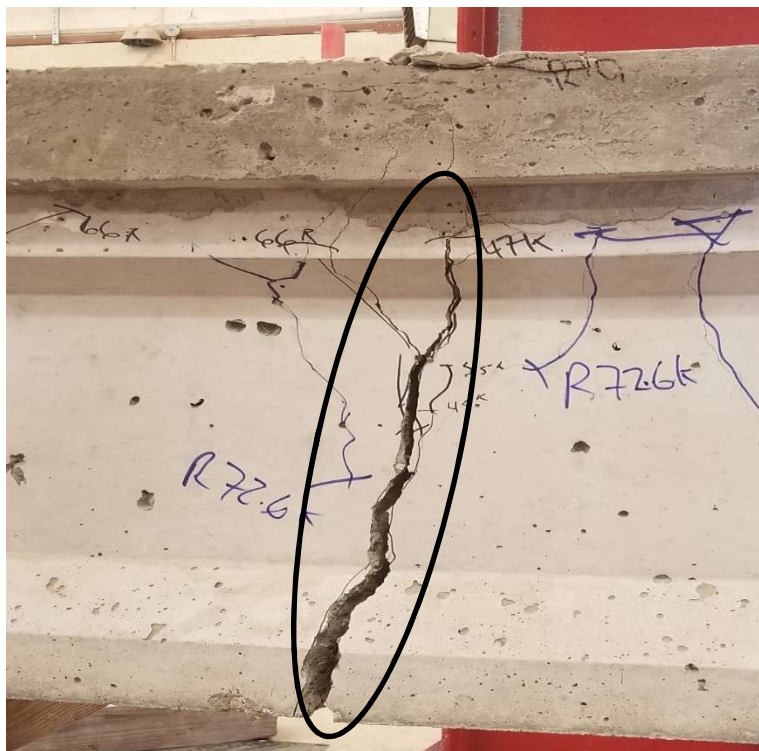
Flexural crack where the prestressing strands ruptured under the load point on the NC1-S girder, indicated by a dark oval
